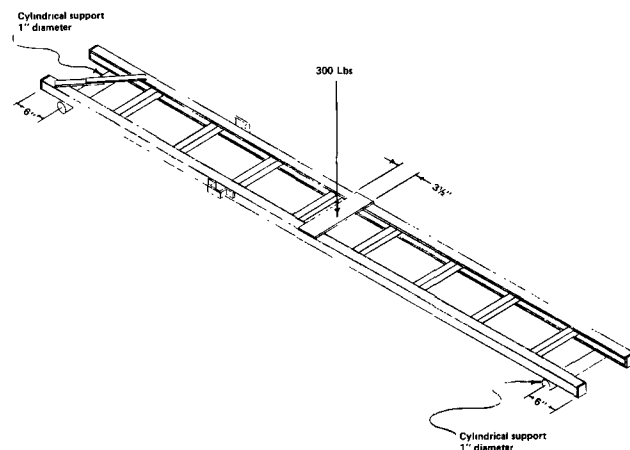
Design Verification Folding Ladder Horizontal Bending Test.
